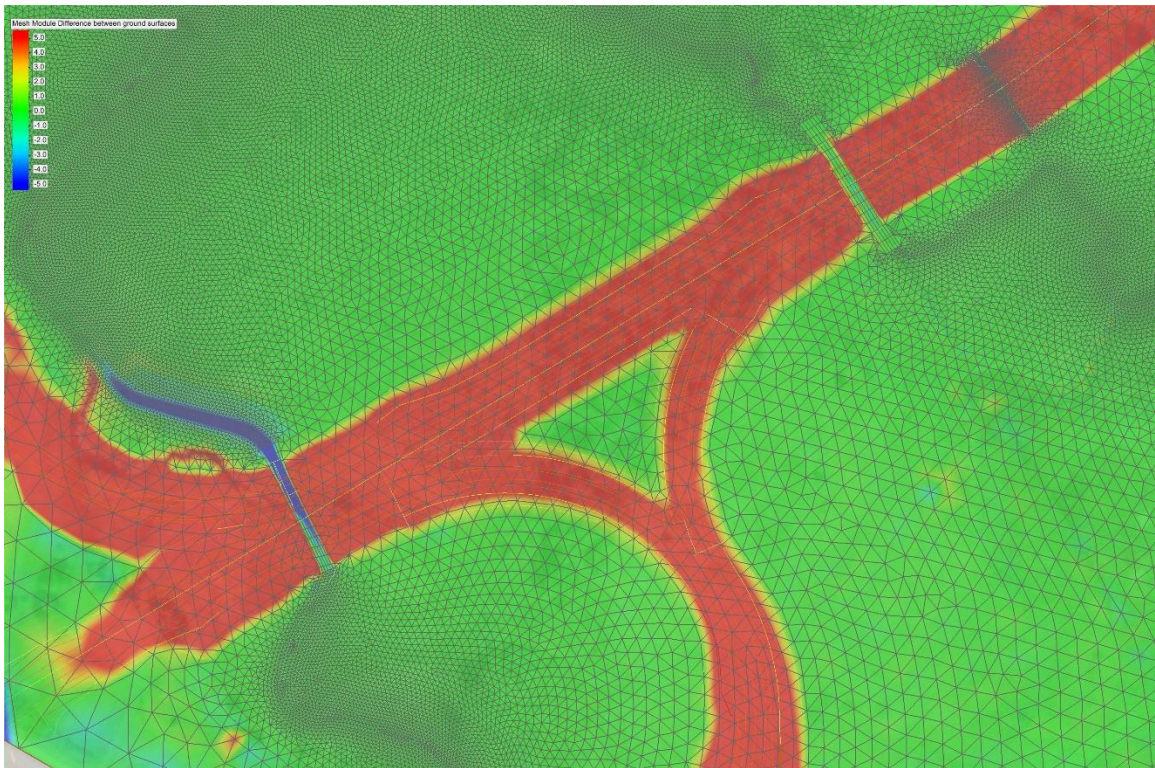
Difference in elevation between existing and proposed conditions highlighting new roadway embankment in red and new stream channel in blue
